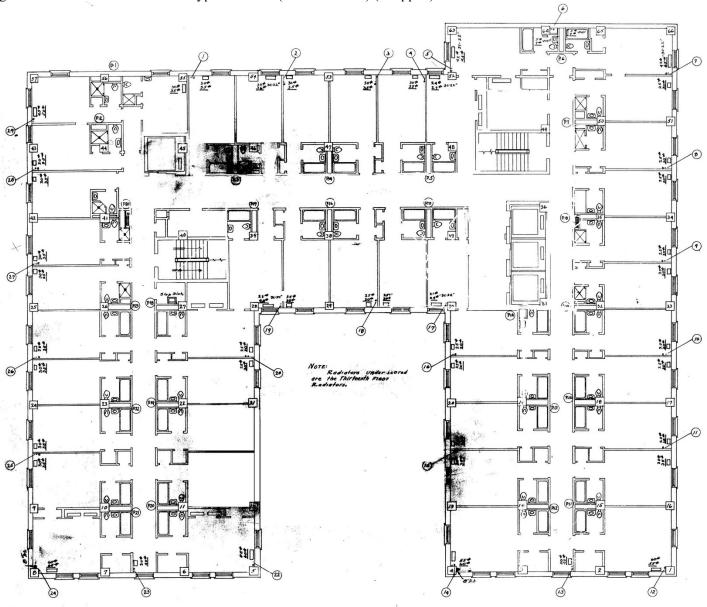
Historic Floor Plan for Typical Floors (3rd-14th Floors) (Cropped)
